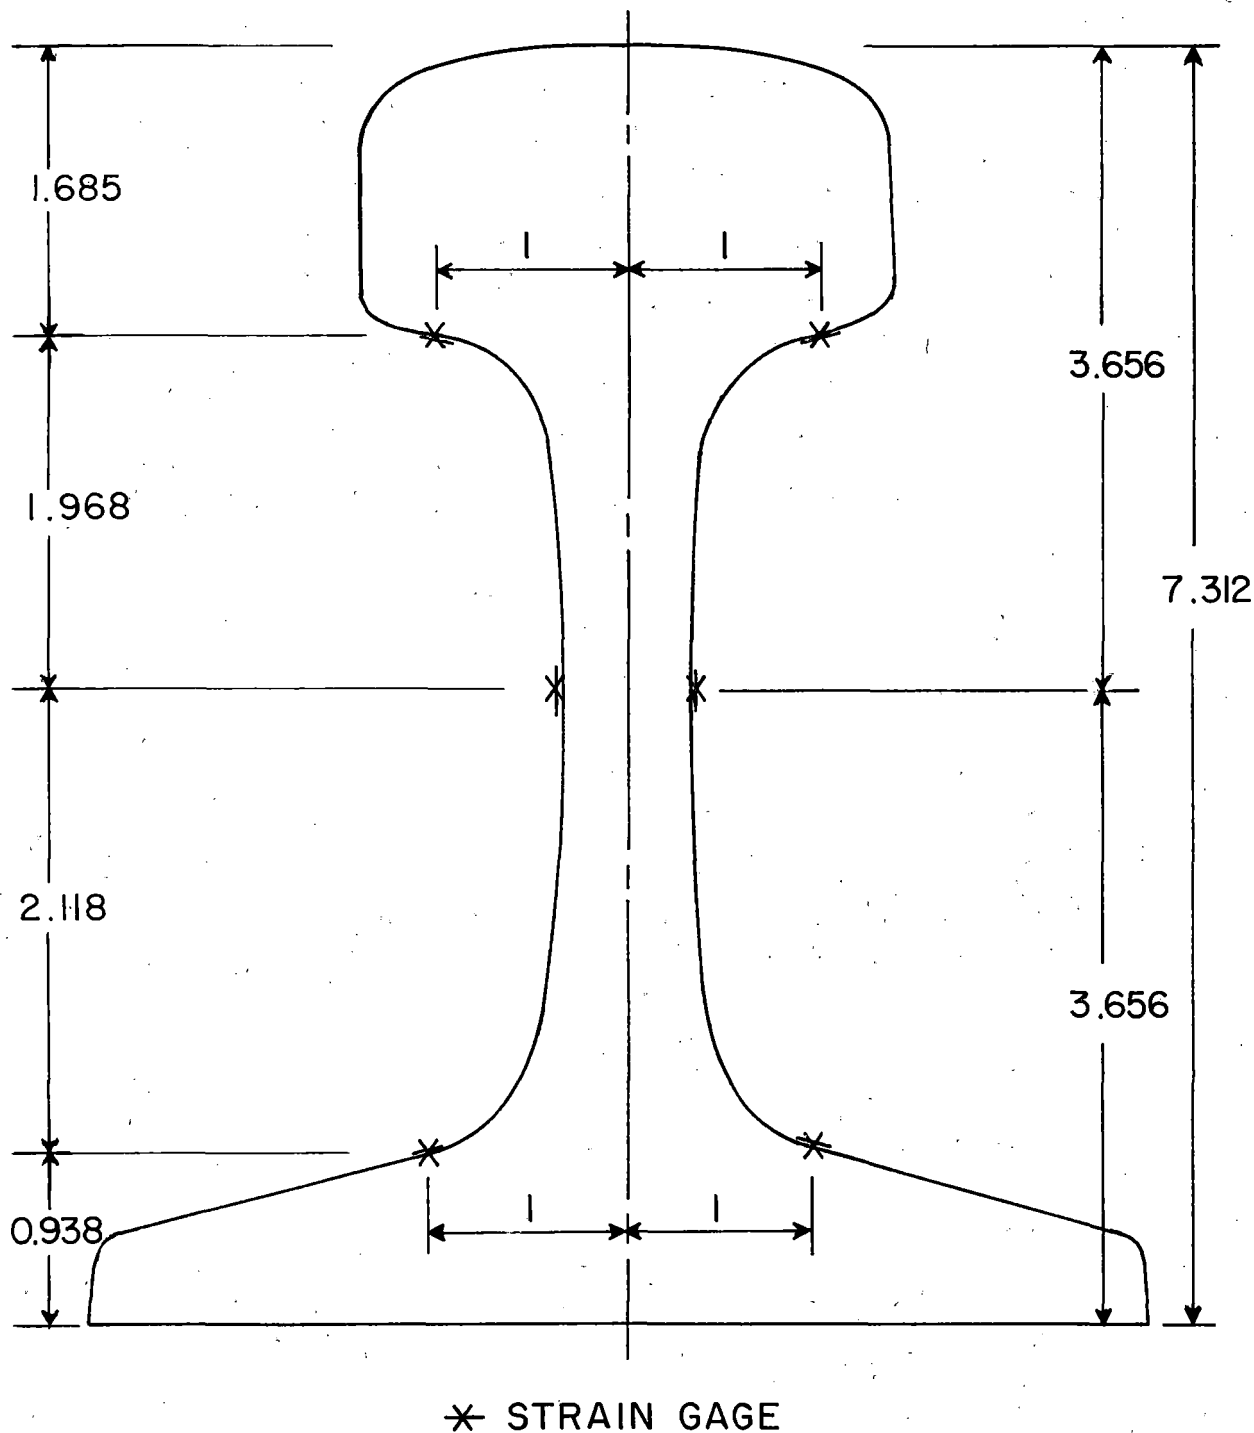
LOCATION OF STRAIN GAGES ON RAIL CROSS SECTION
